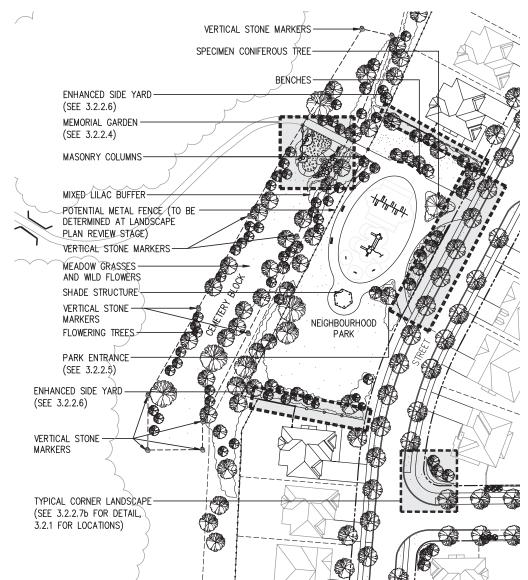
Neighbourhood Park Concept Plan
